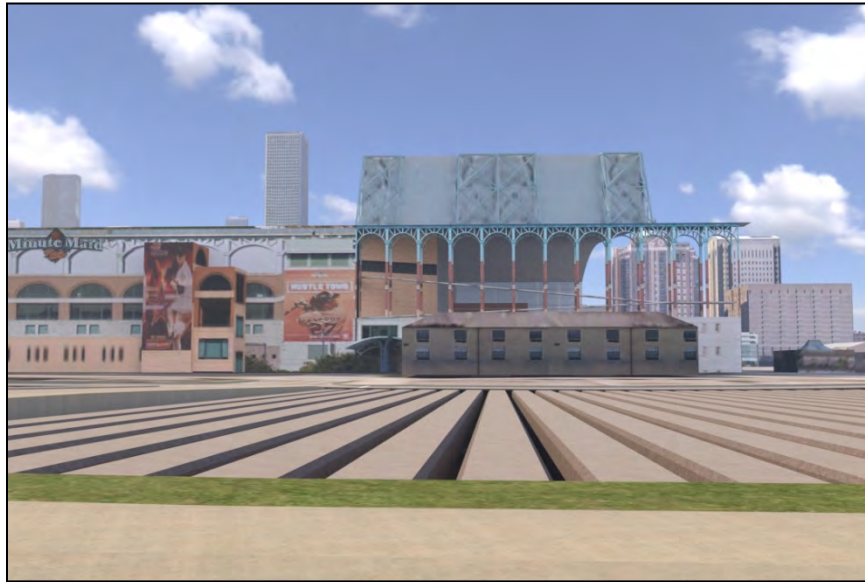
Digital rendering of the proposed new depressed roadway of the Proposed Action adjacent to Cheek Neal as it would look as completed by TxDOT.
